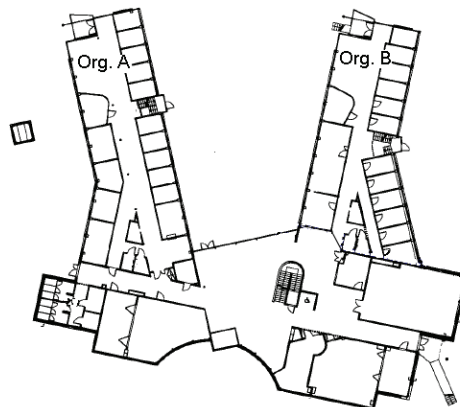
Plan view of the first floor of Building 1. Modified from (Statsbygg, 2002).
